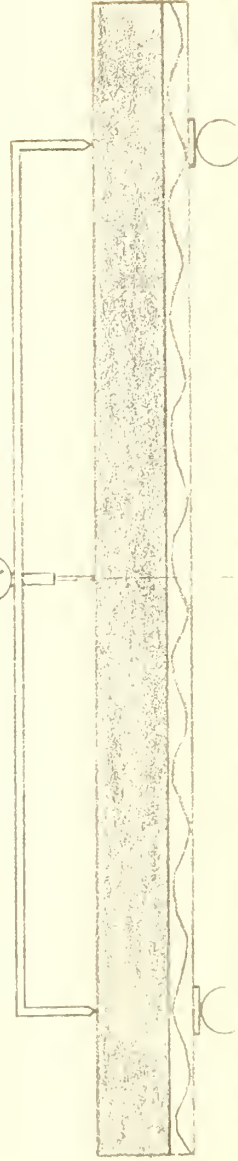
LOADING ARRANGEMENT FOR SHORT TERM TESTS
